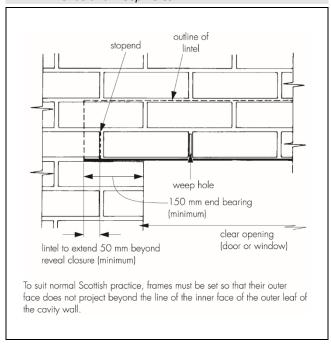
Detail showing minimum end bearing, stopends and weep holes
